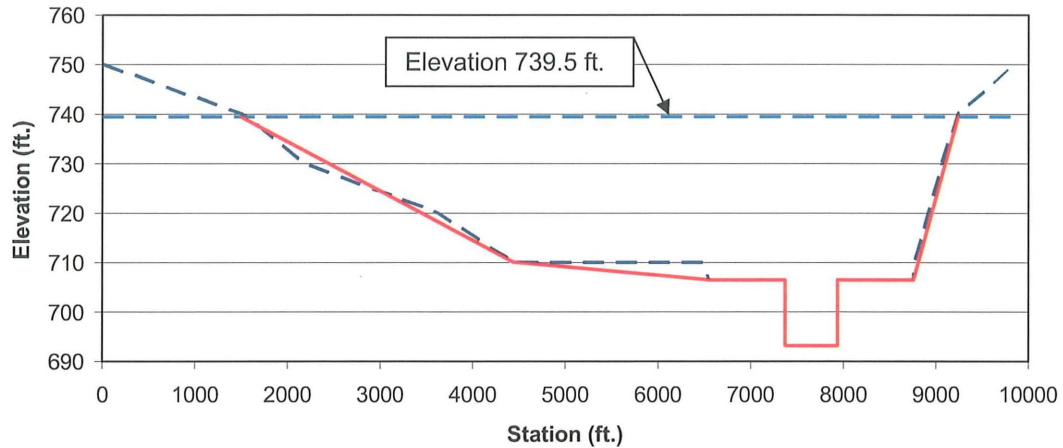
De Cordova Bend Dam and Abutments Approximated Section Elevation 739.5 ft. Headwater
